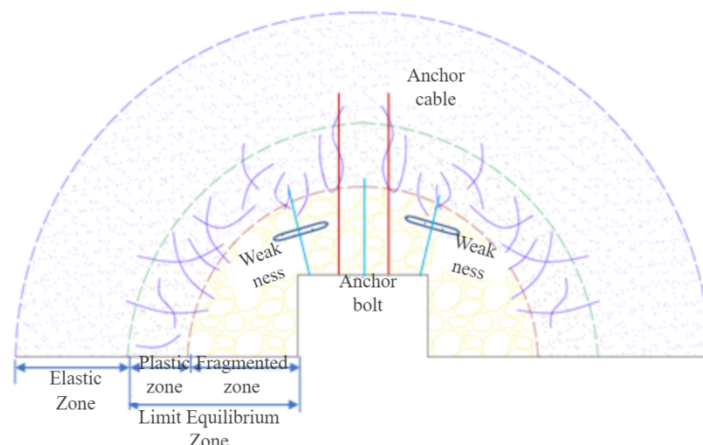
Anchoring and bearing structure reinforced by high-strength rock bolts and anchor cables for the surrounding rock of weakly cemented muddy roadway
